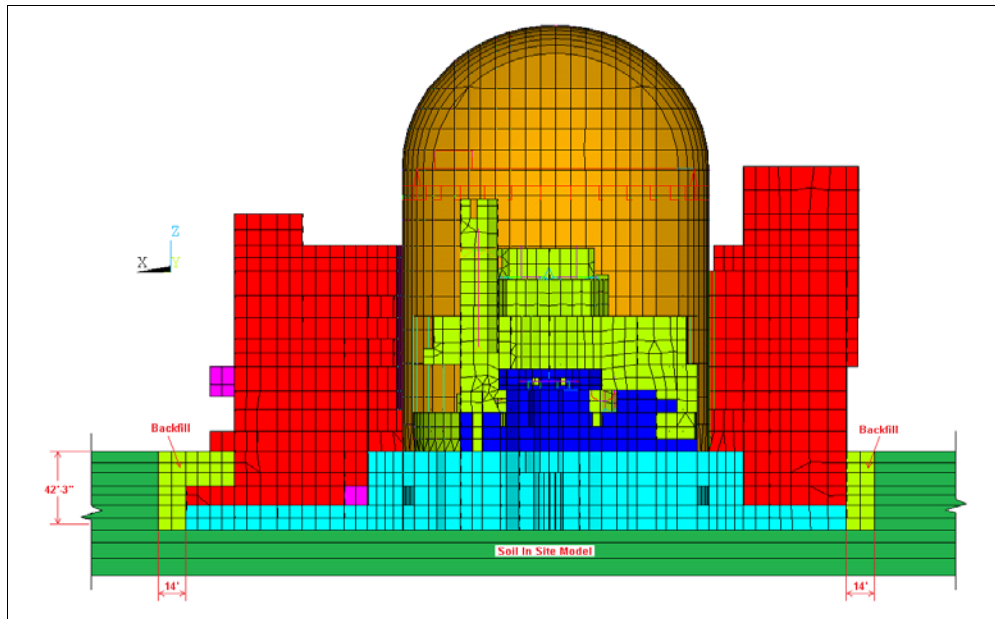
RBC Model Sectional View, Section through the Center Line (looking to the West)
